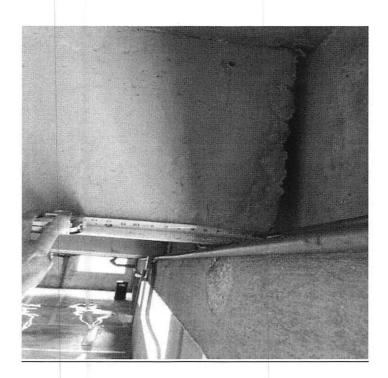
Spalled face of a haunch below a supported joist.
